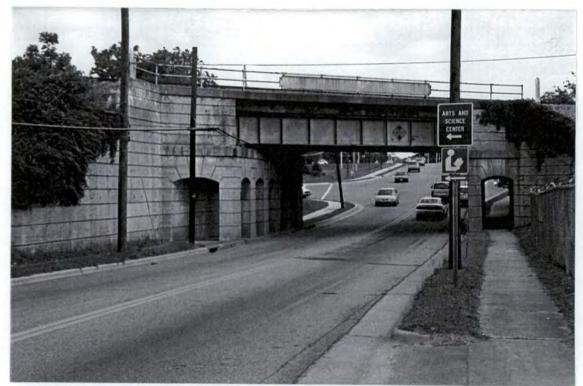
Highland Avenue Southern Railway Bridge – south elevation, looking north
